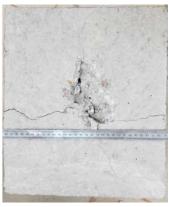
Cracking in concrete slab (XTRW - cross-threaded rebar connection without interlayer)
